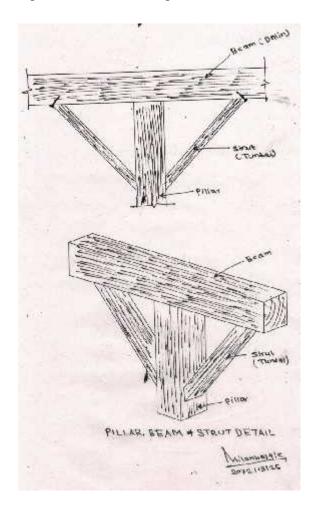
Pillar, Beam & Strut (Sketch drawn on site, 2015)
